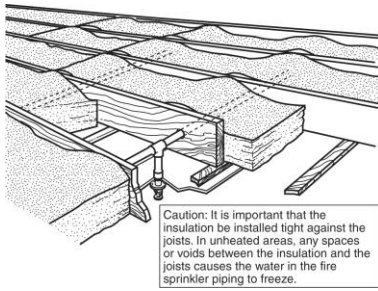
(a) Insulation Recommendations – Arrangement 1.
